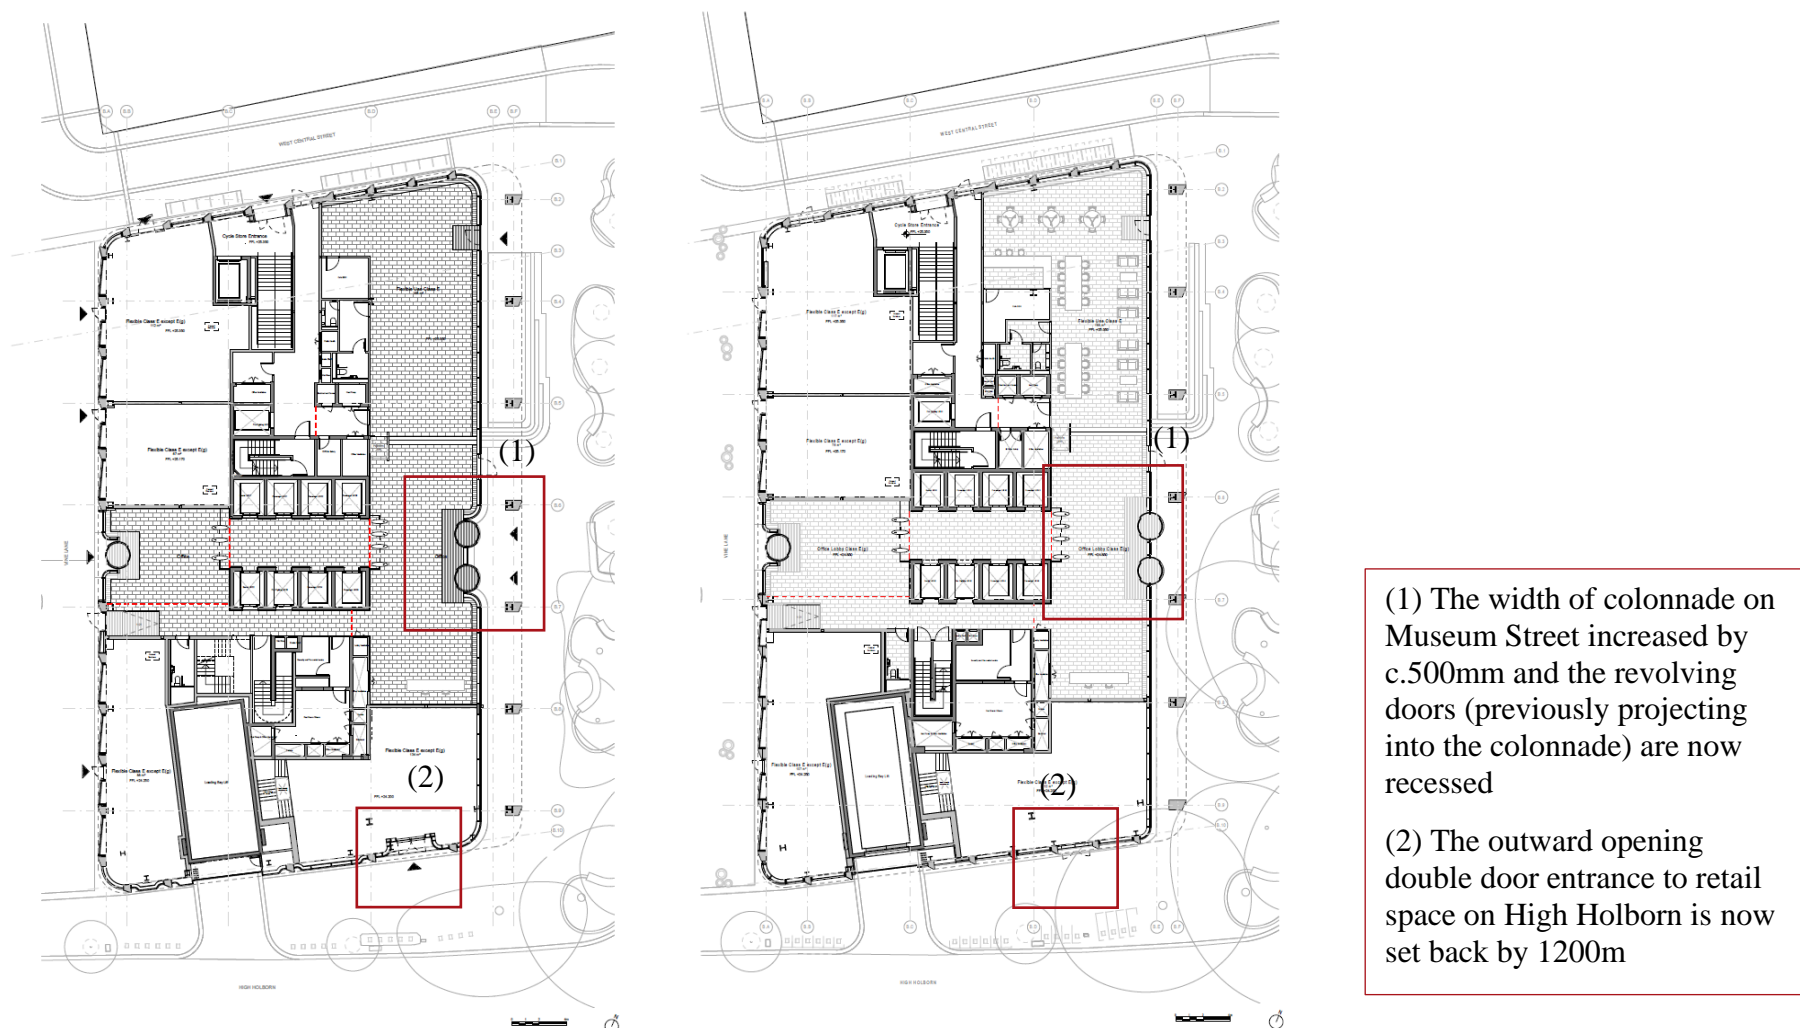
Current (February 2022) ground floor plan of One Museum Street (left); previous (February 2021) ground floor plan of One Museum Street
